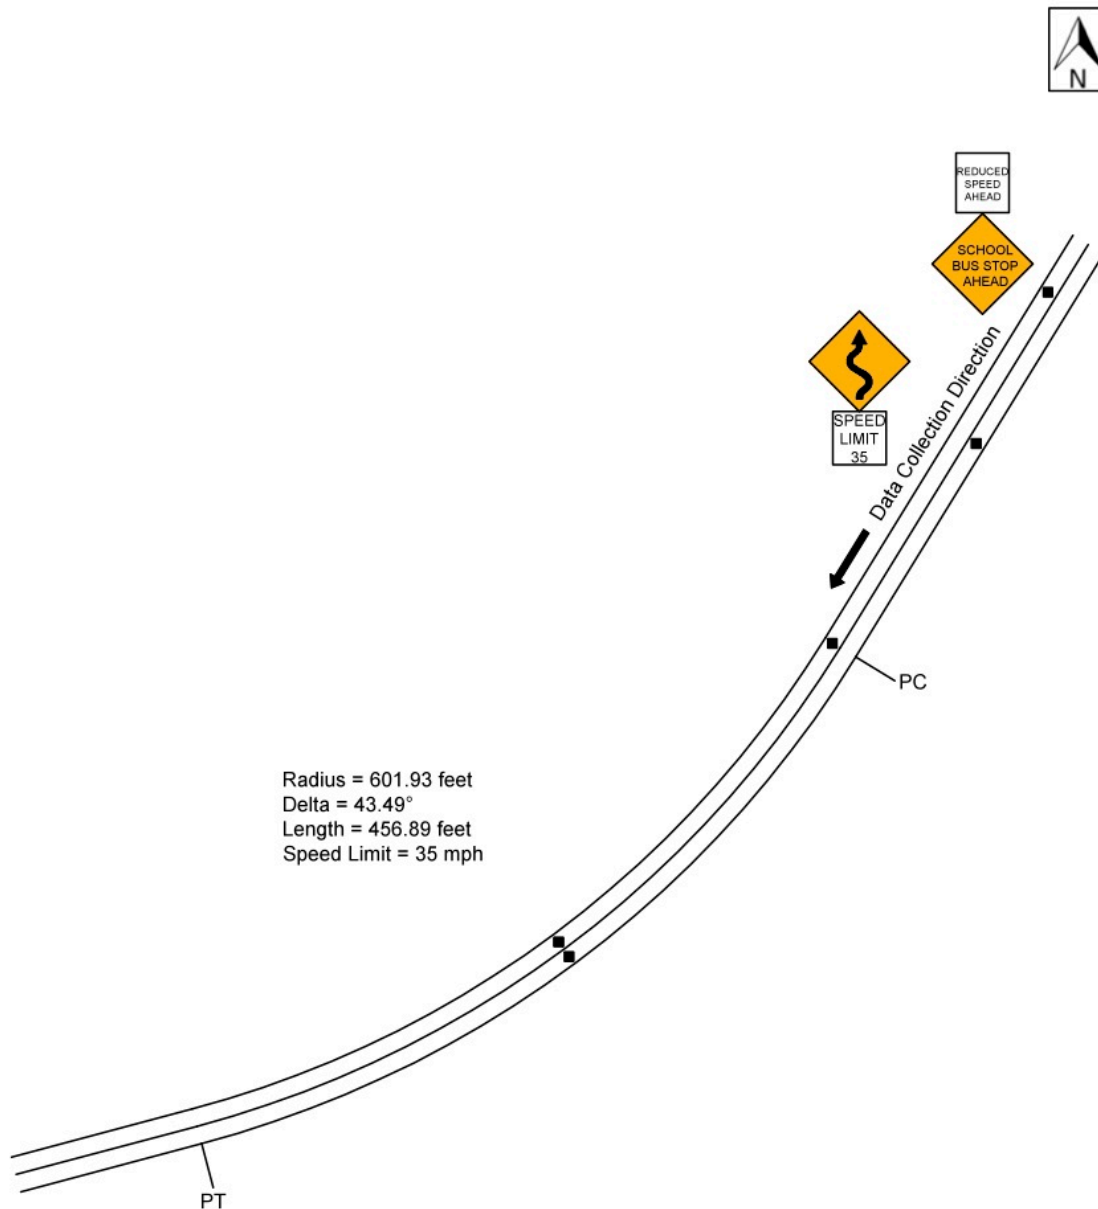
Diagram. Geometric layout of Alabama Location #7 (not to scale).
